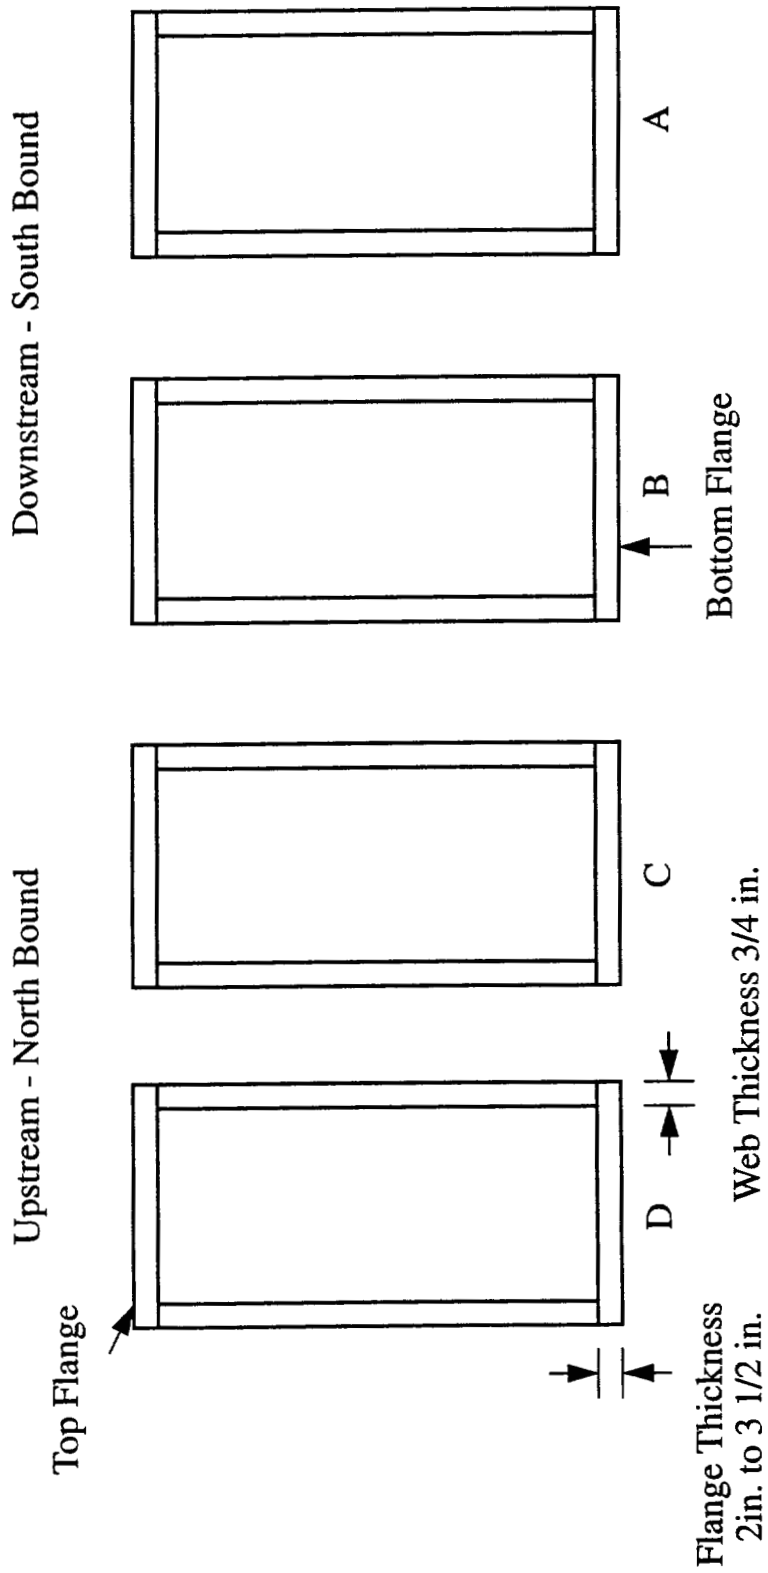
(c) Schematic Cross-Sectional View of the Box Girders Illustrating Their Labeling Sequence
